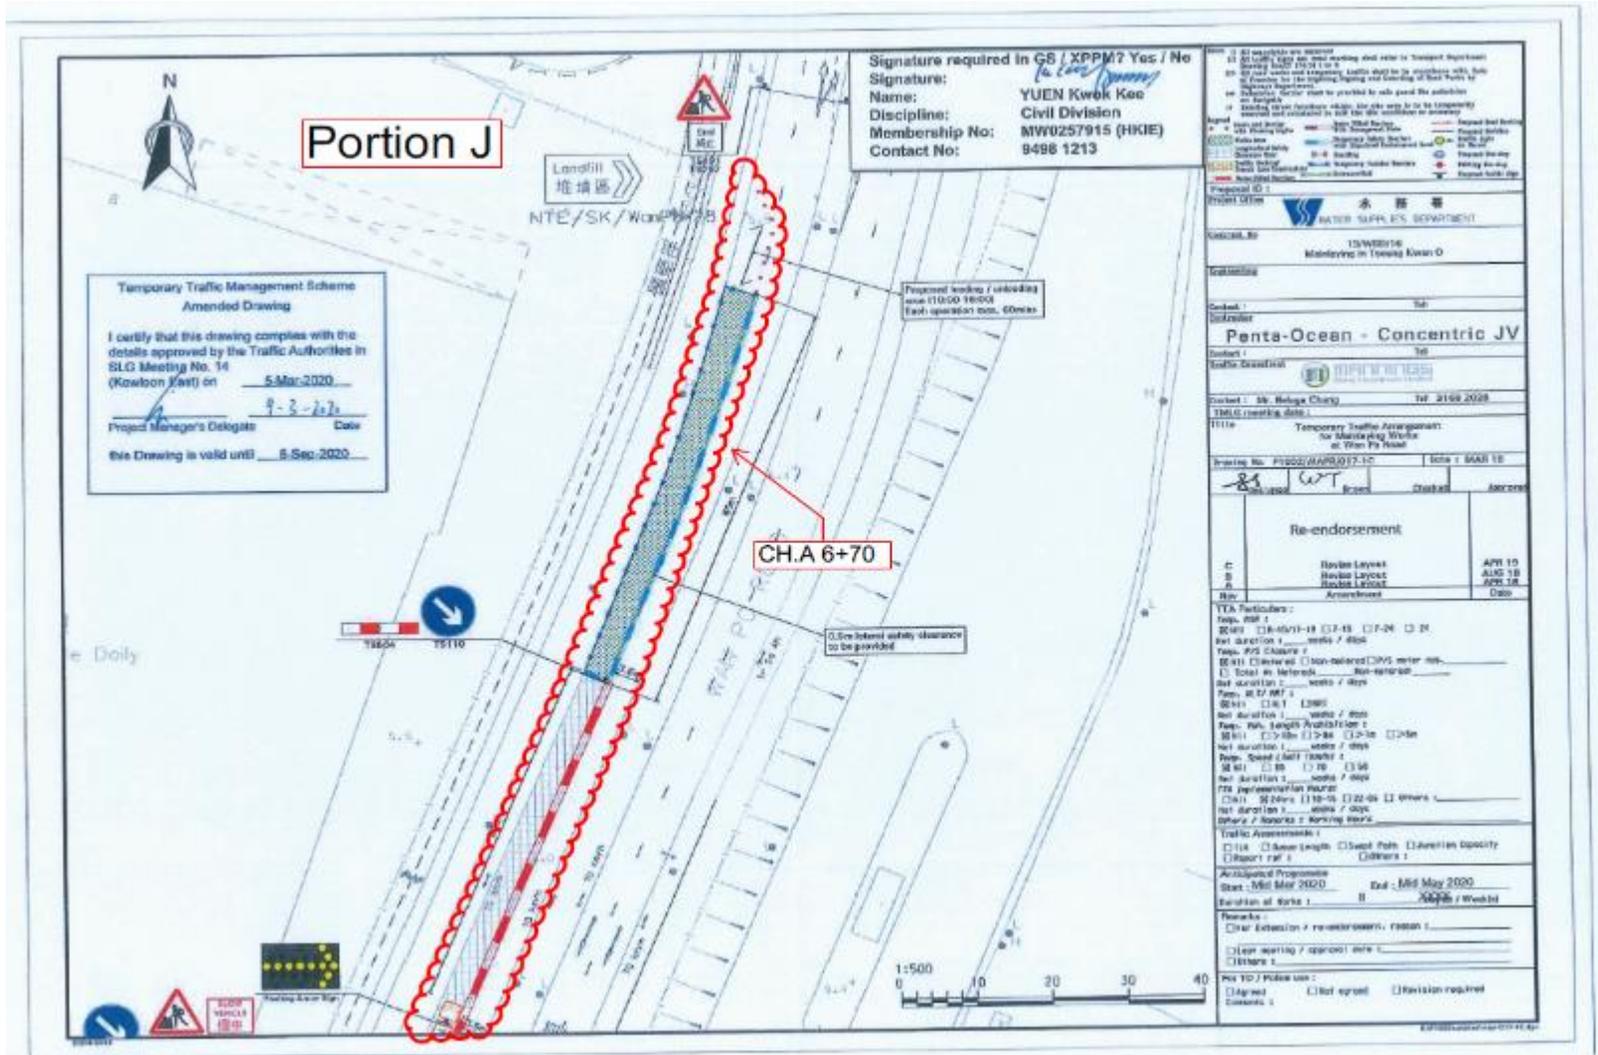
(i). Location Plan for Portion J - CH.A 6+70
